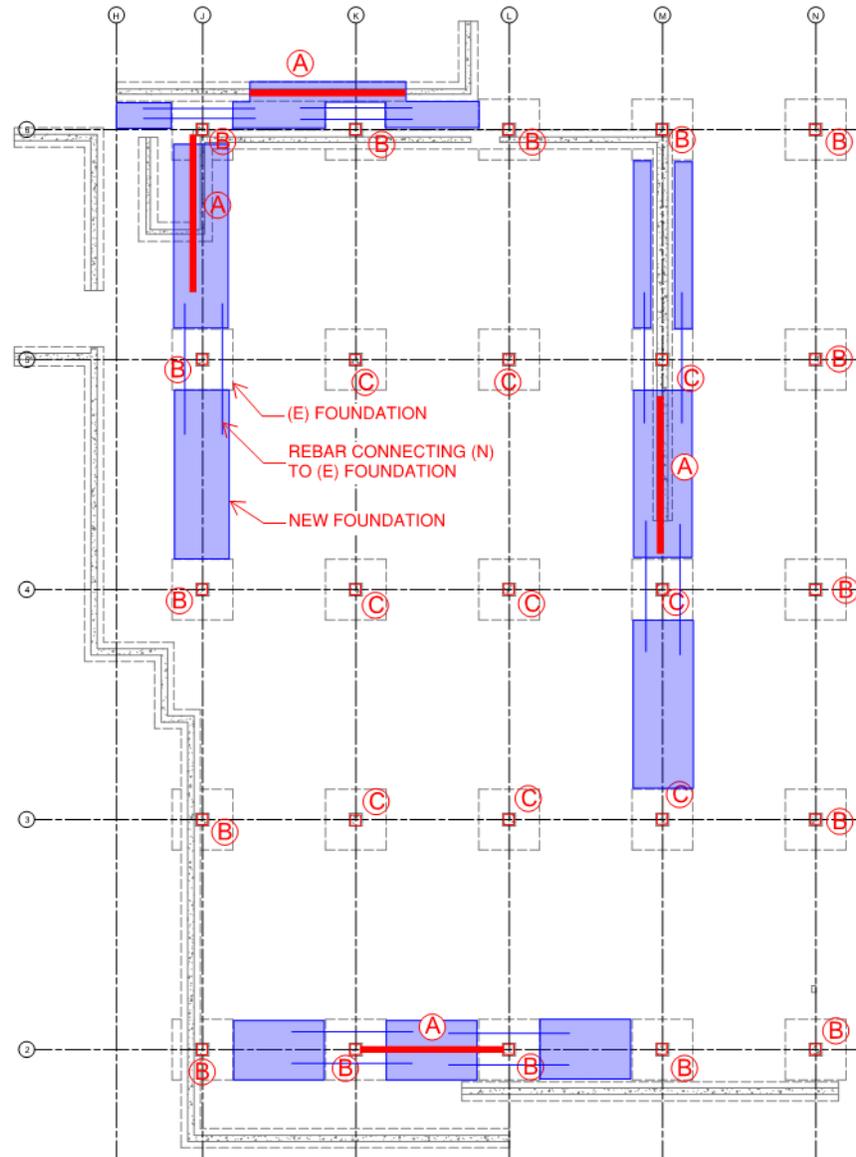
Foundation plan at Courthouse indicating: A=proposed locations of retrofitted shear walls; B=exterior concrete columns; C=interior concrete columns; purple boxes=new footings
